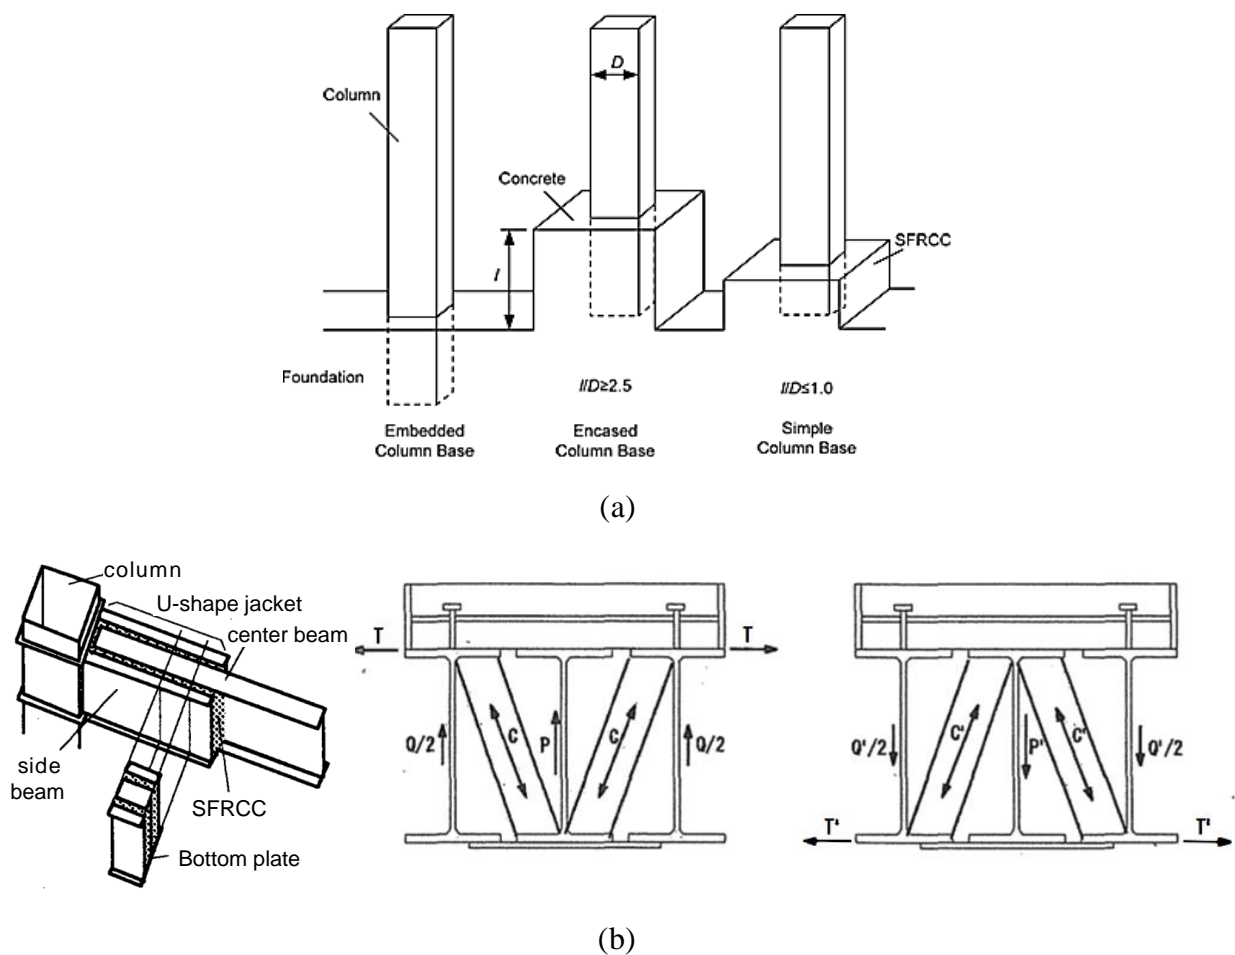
Application of SFRCC steel moment resistant frame building: (a) Steel column base; (b) Steel beam-to-column connection with U-shape bracket
